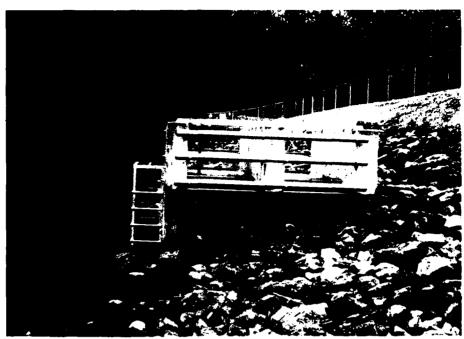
Principal spillway structure and upstream slope of dam (6/2/80).
